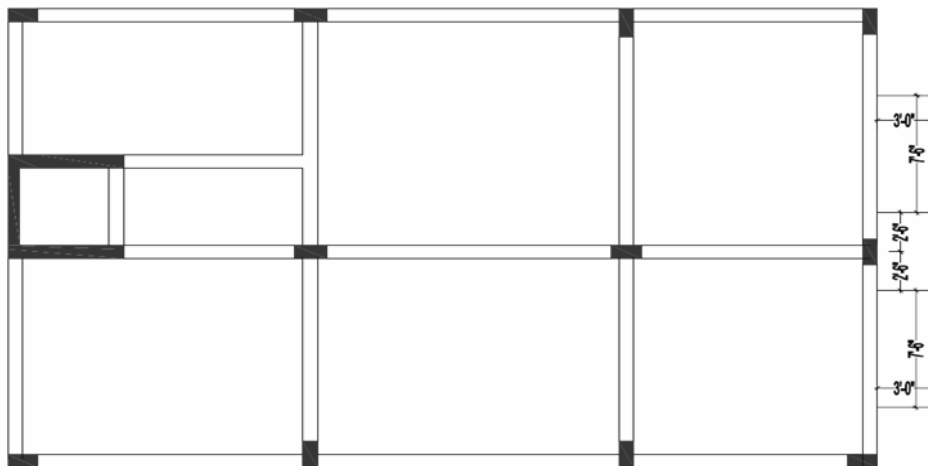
Typical Floor Beam and Slab Layout Plan
